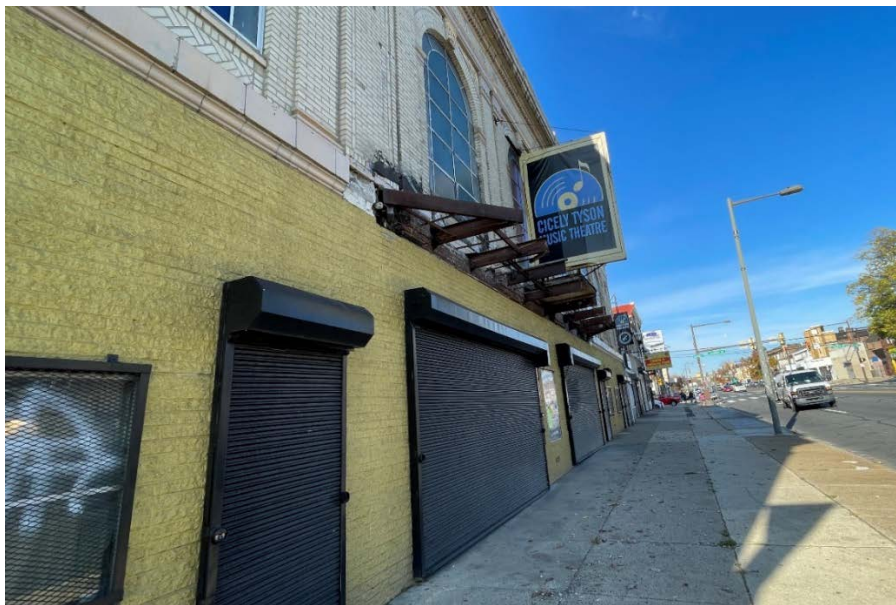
The east elevation of the building, viewed from the pedestrian level.
